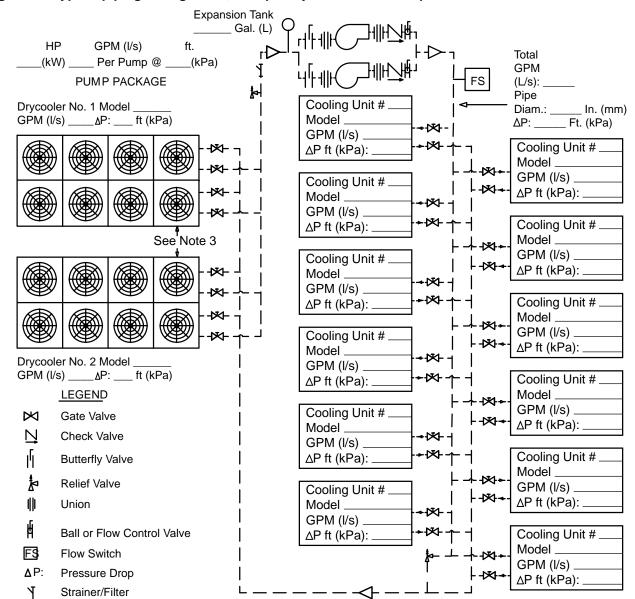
Typical piping arrangement, multiple drycoolers and multiple indoor units
